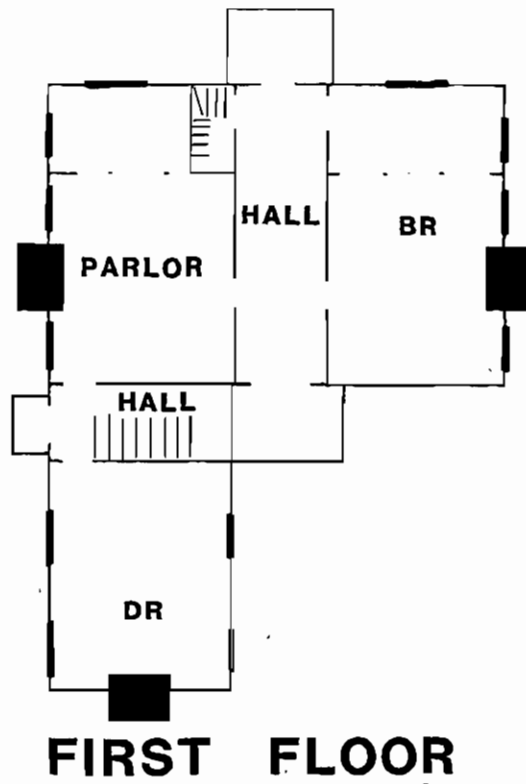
Reconstructed floor plans of the Rosemont Plantation house.
